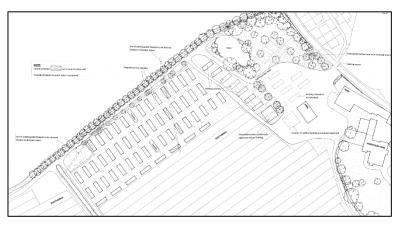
Proposed site plan with footpath notes added and siting of caravans
